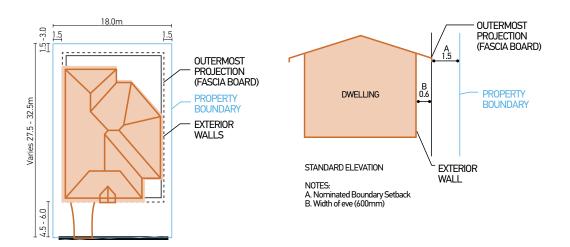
Traditional Allotment - Typical Building Envelope and Setback Plan
